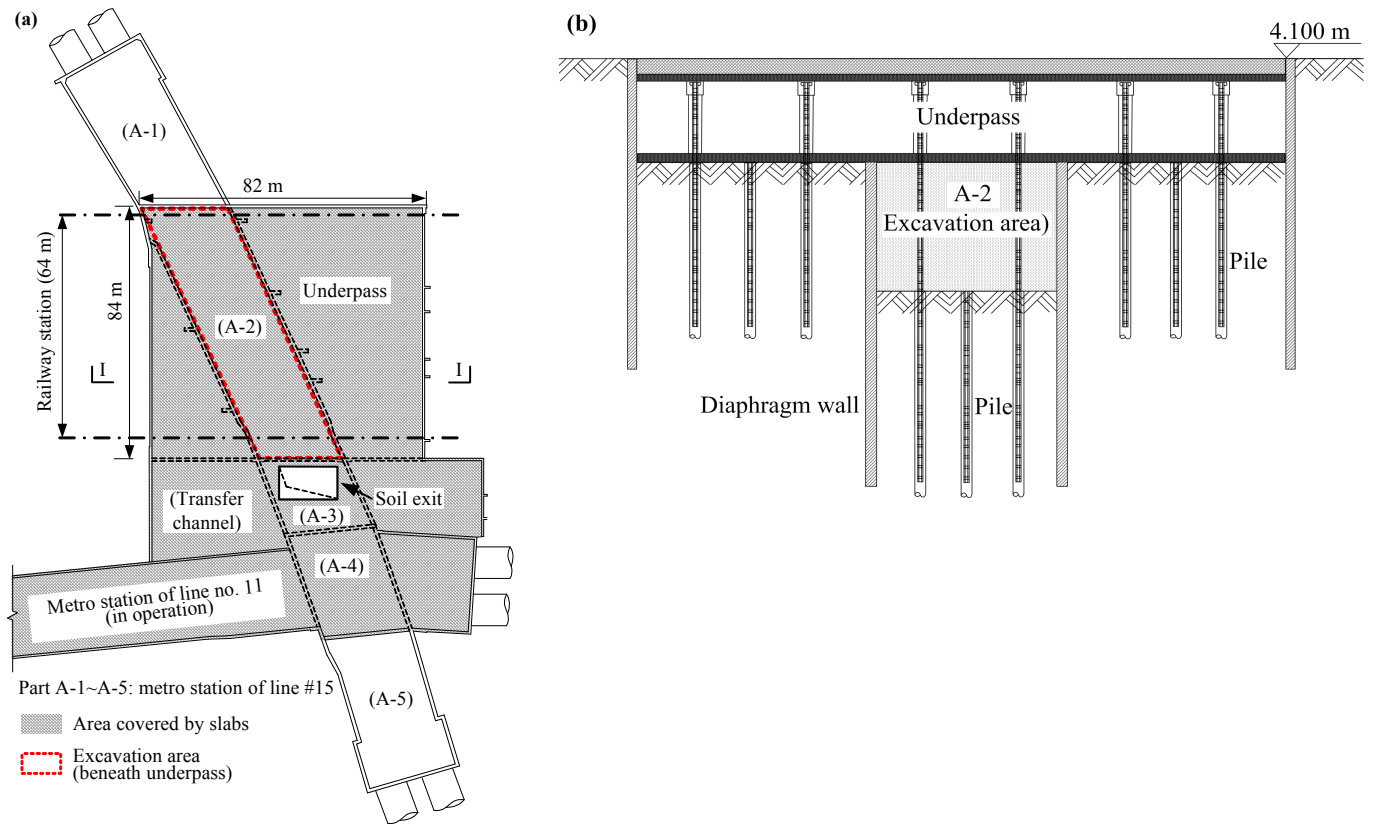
Excavation site and surrounding environment: (a) plan view; (b) profile of section I-I.
